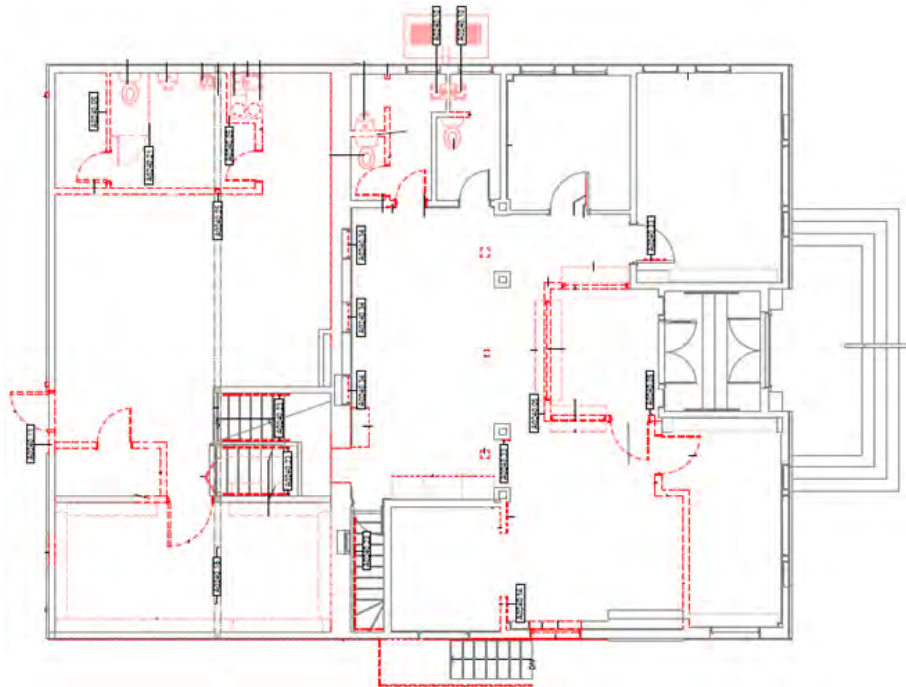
Demolition plan, first floor of addition and main floor of original building showing the non-original partition walls that would be removed as part of the rehabilitation. Plans courtesy of ORW Architecture. November 2022.
